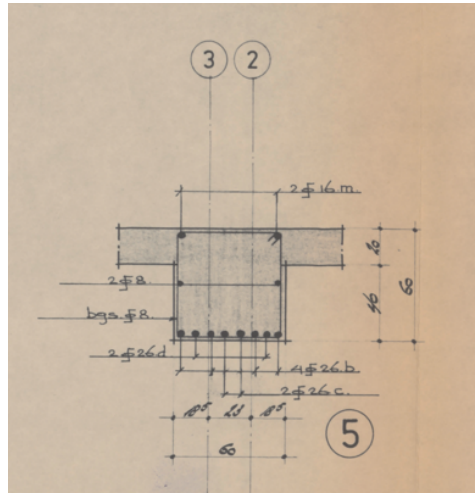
Cross-section of the beam of Munthof at the shear joint
